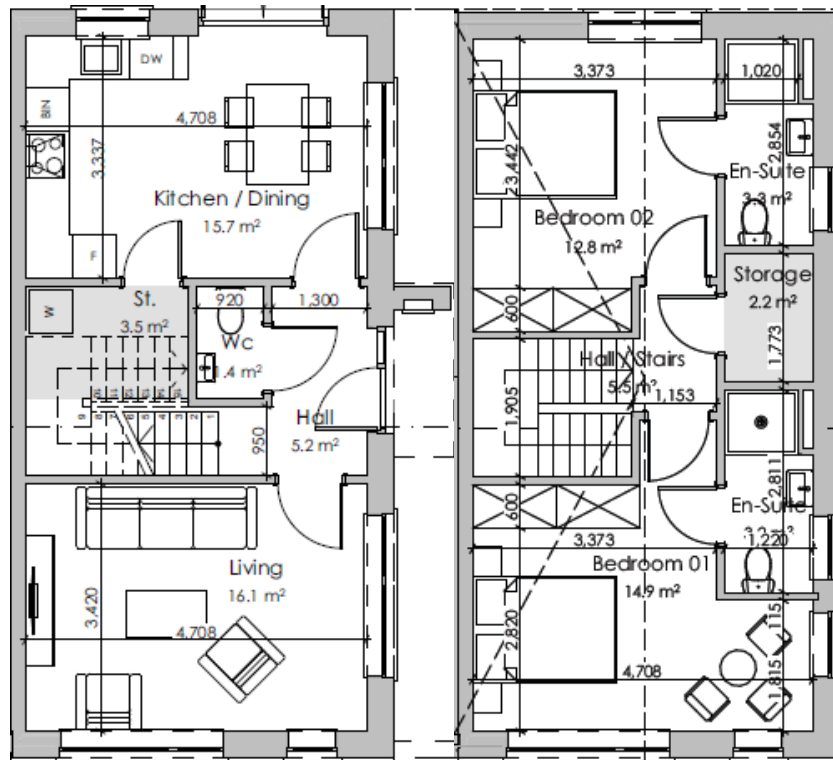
Ground (l) and first (r) floor plans of House Type 2.4.
